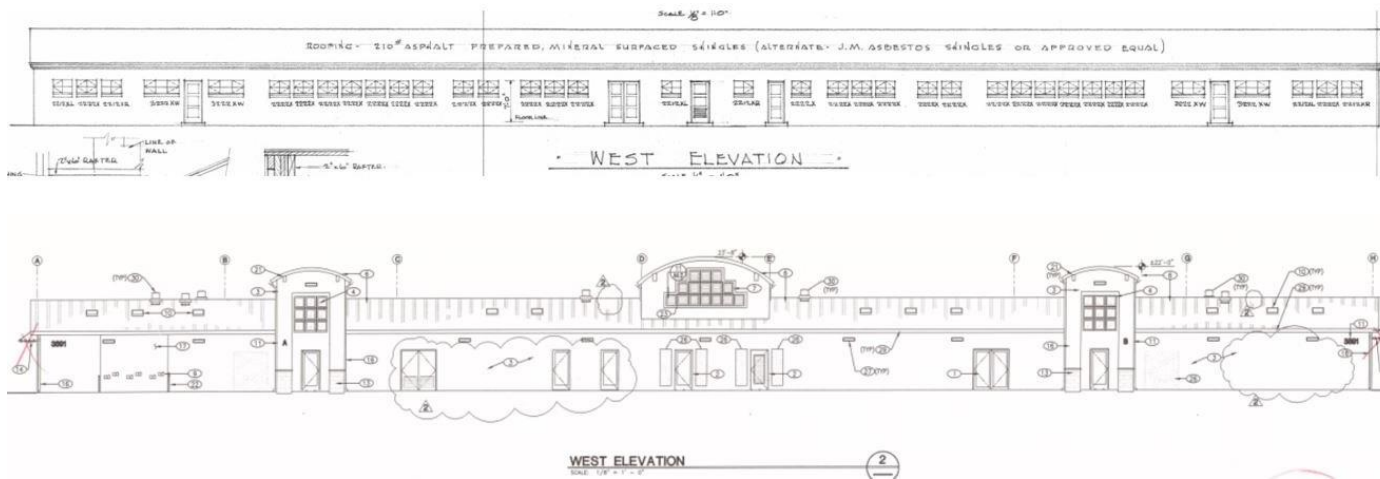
1949 As-Built Drawing (top) 2006 Renovation Drawing (bottom) (DPR Elevations)
